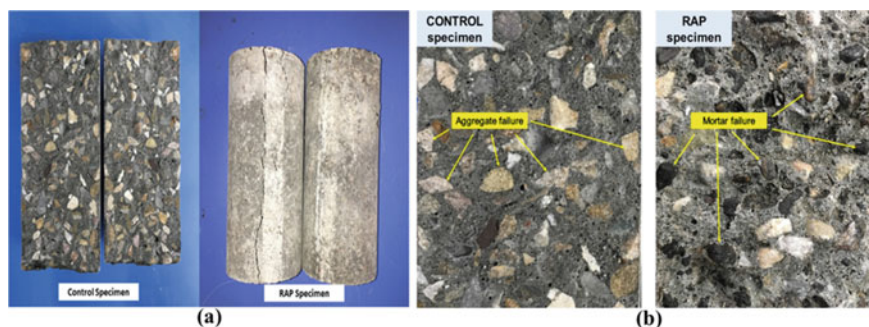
a Split specimens after test [38], b failure mode in natural and RAP mix [15]
